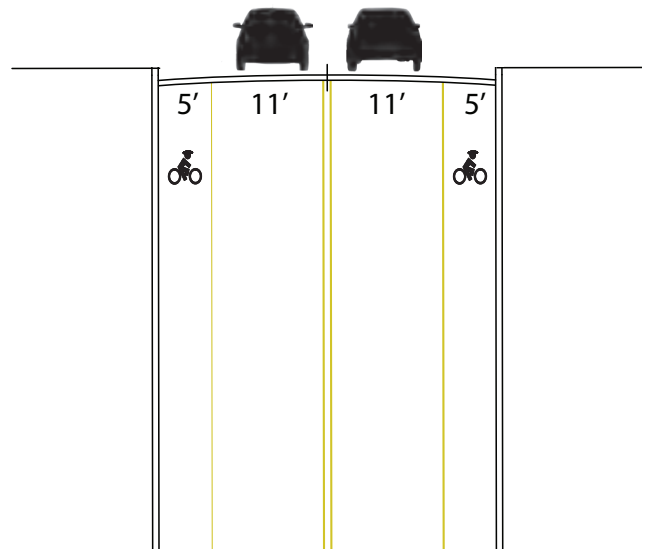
Option 2 - 32-feet of Broad Street with Two 11-foot Travel Lanes and Two 5-foot Bike Lanes
